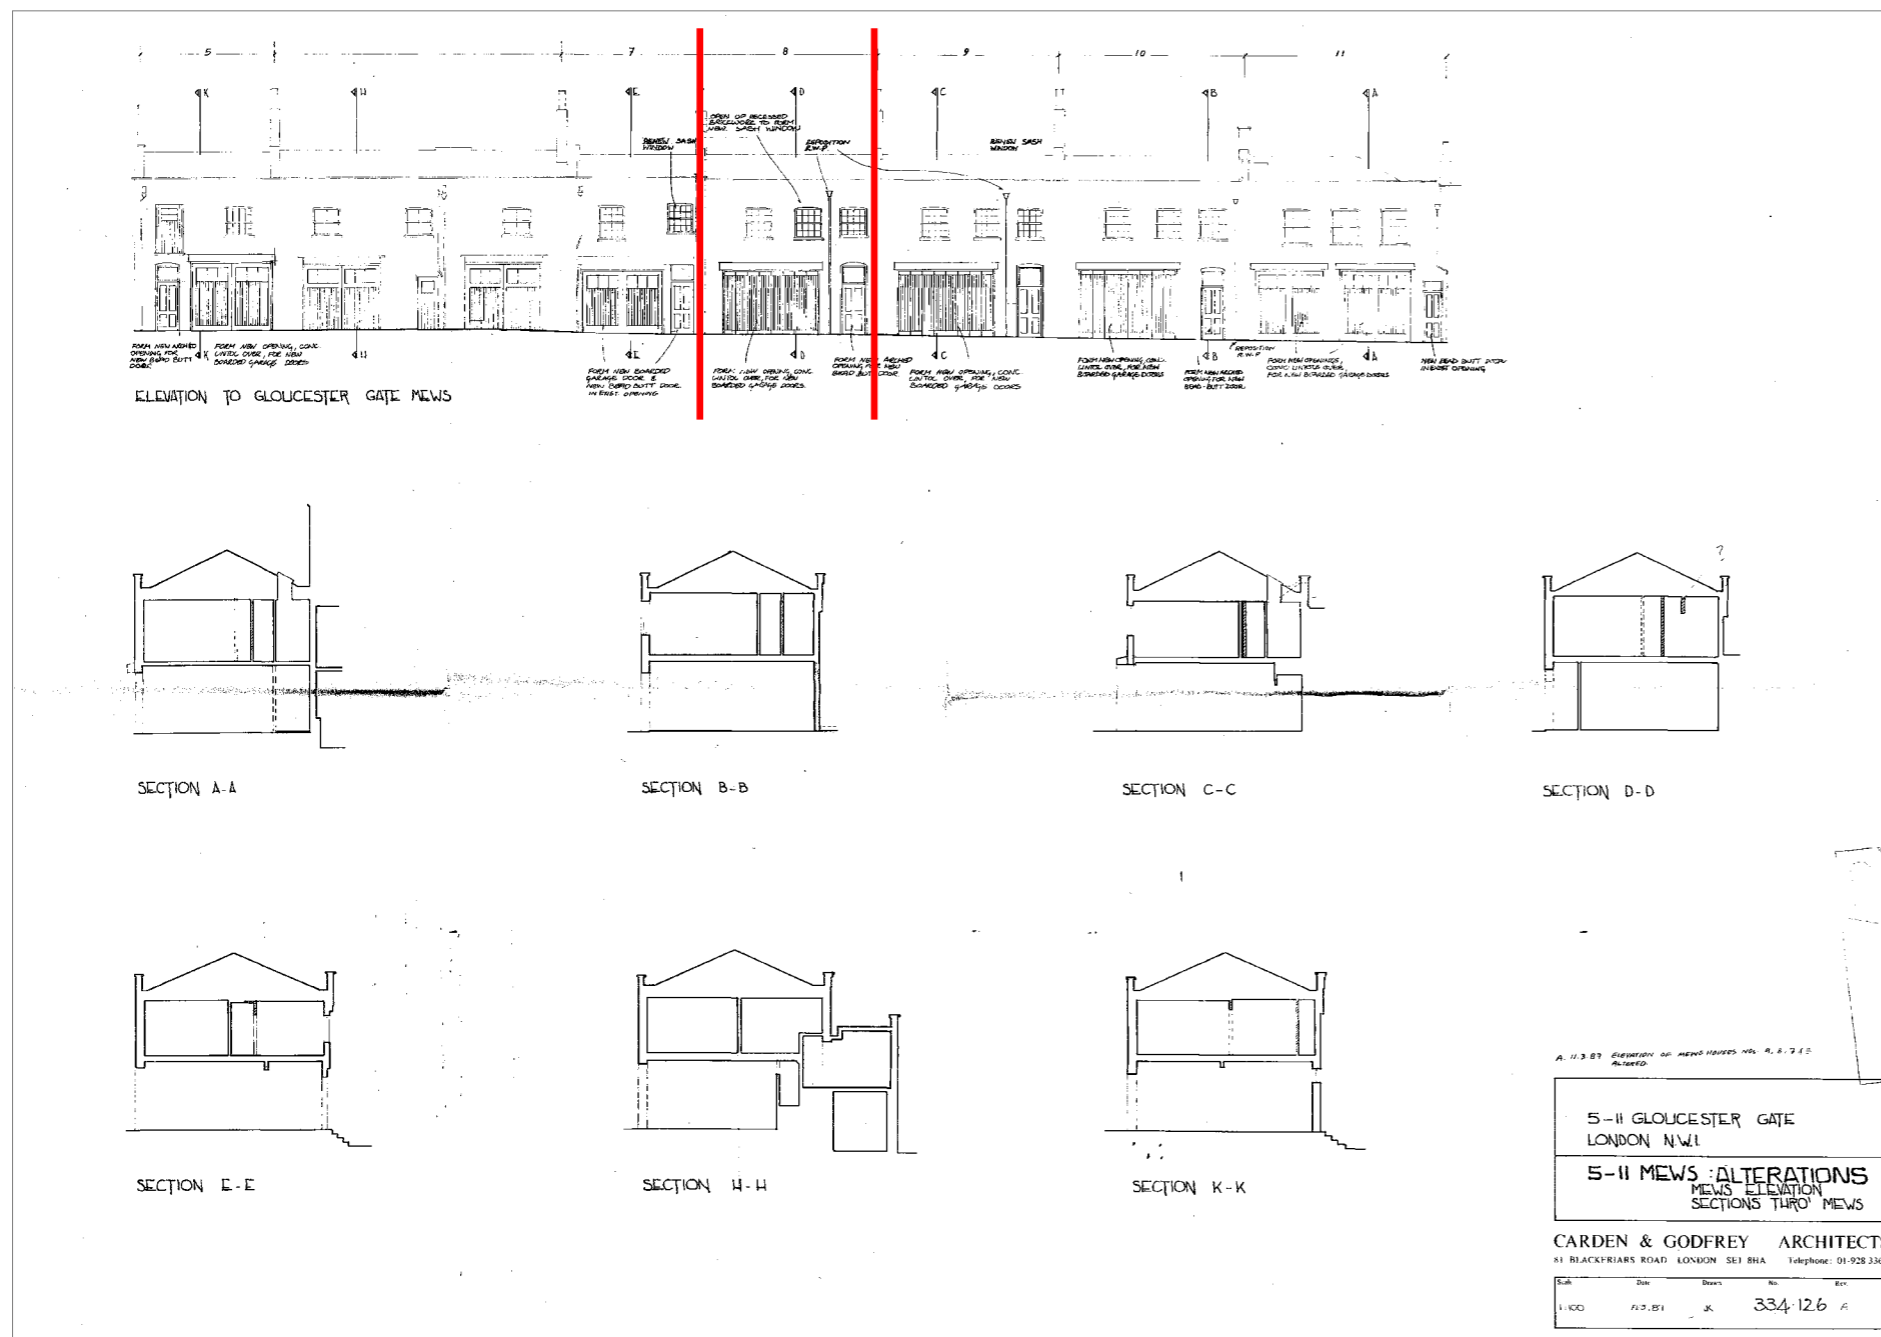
Consented plans for works to exterior of the mews house, 1987.
